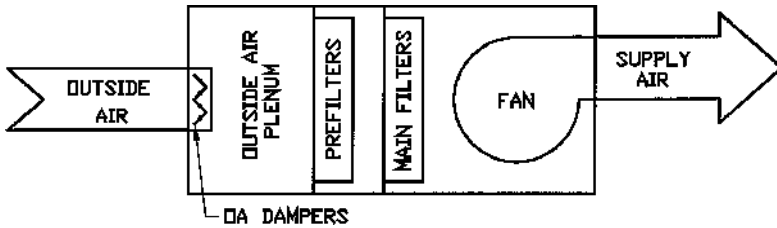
AHU EXAMPLE 4 AIR HANDLING UNITS—VENTILATING 100% OUTSIDE AIR.
